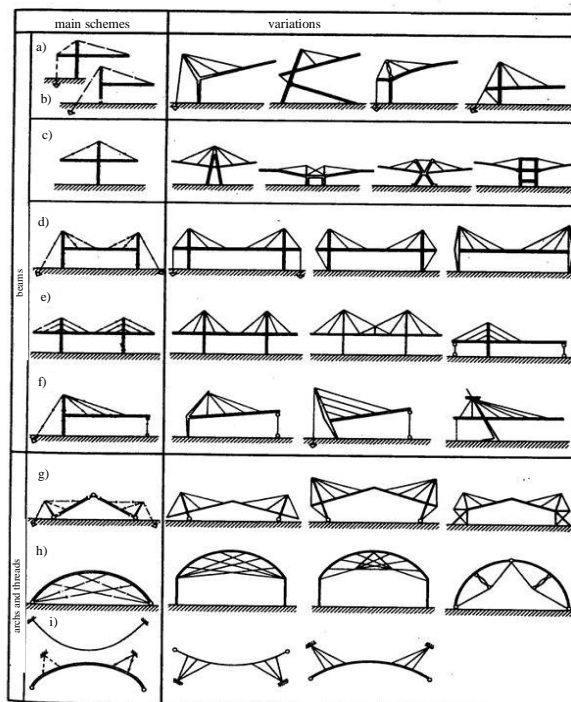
The front views of pillars and guys in suspended cable-stayed roof structures
